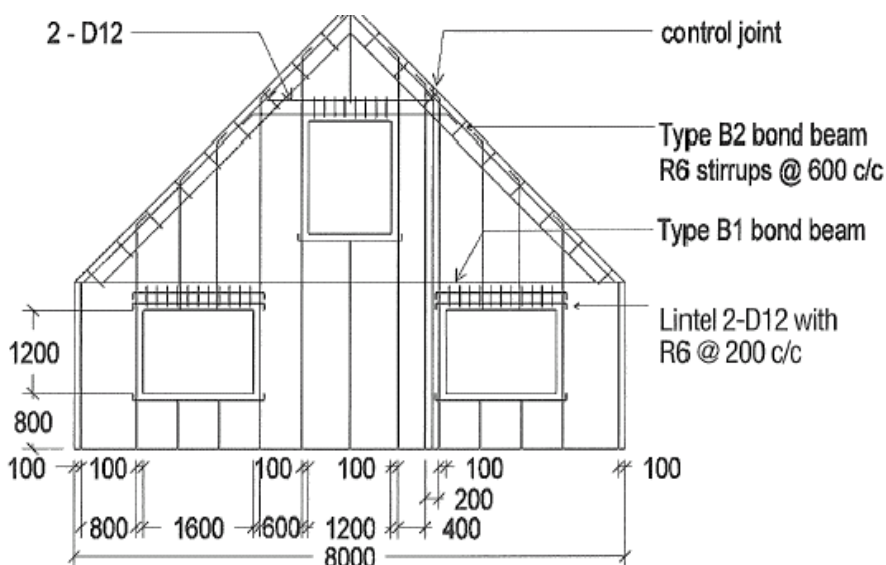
Bond Beam and Lintel Reinforcement for West Wall (Bracing Line B)
